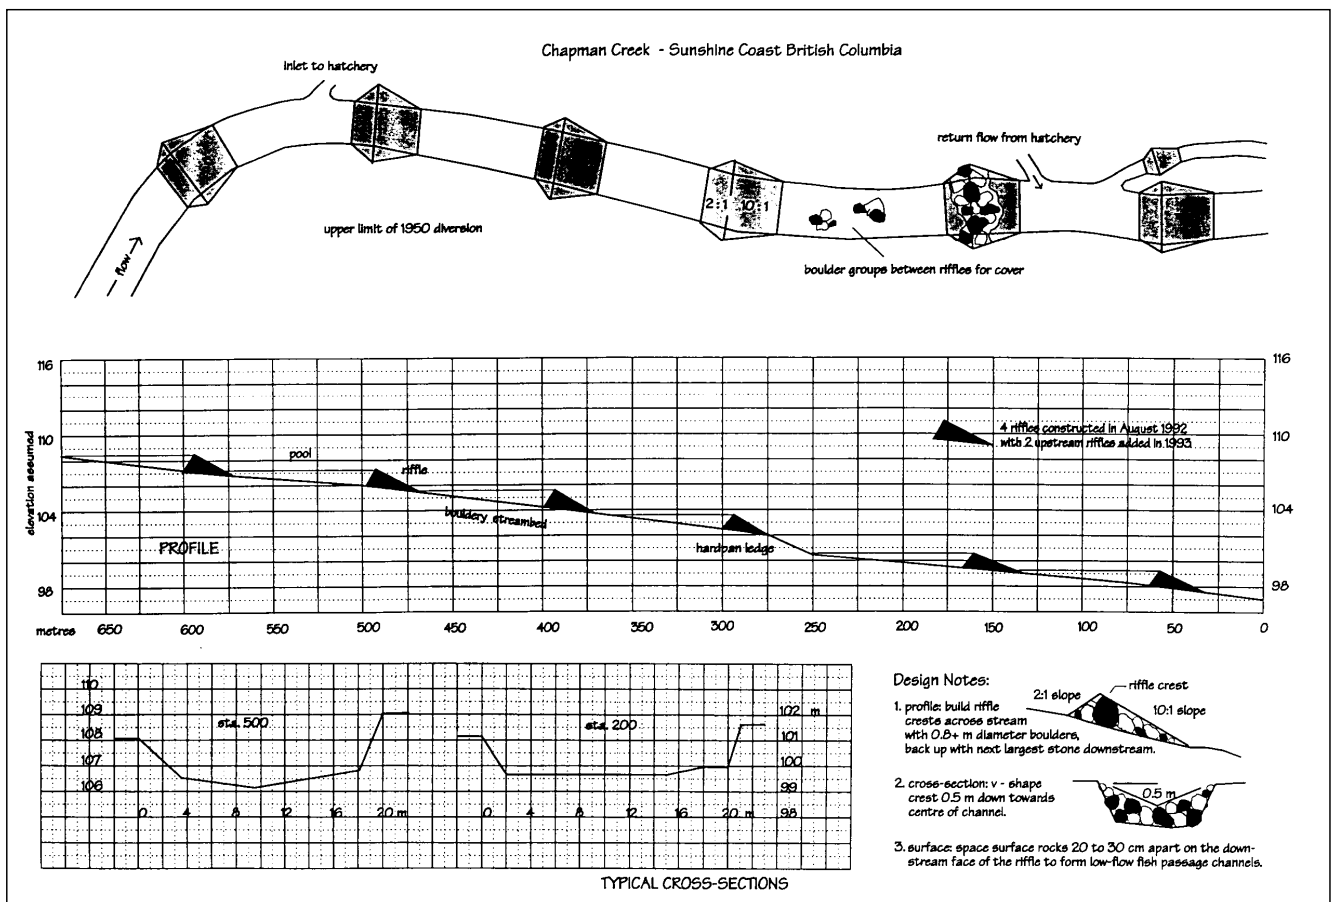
Condensed plan and profile drawings for the Chapman Creek Restoration Project (Newbury, Gaboury and Bates 1997)
